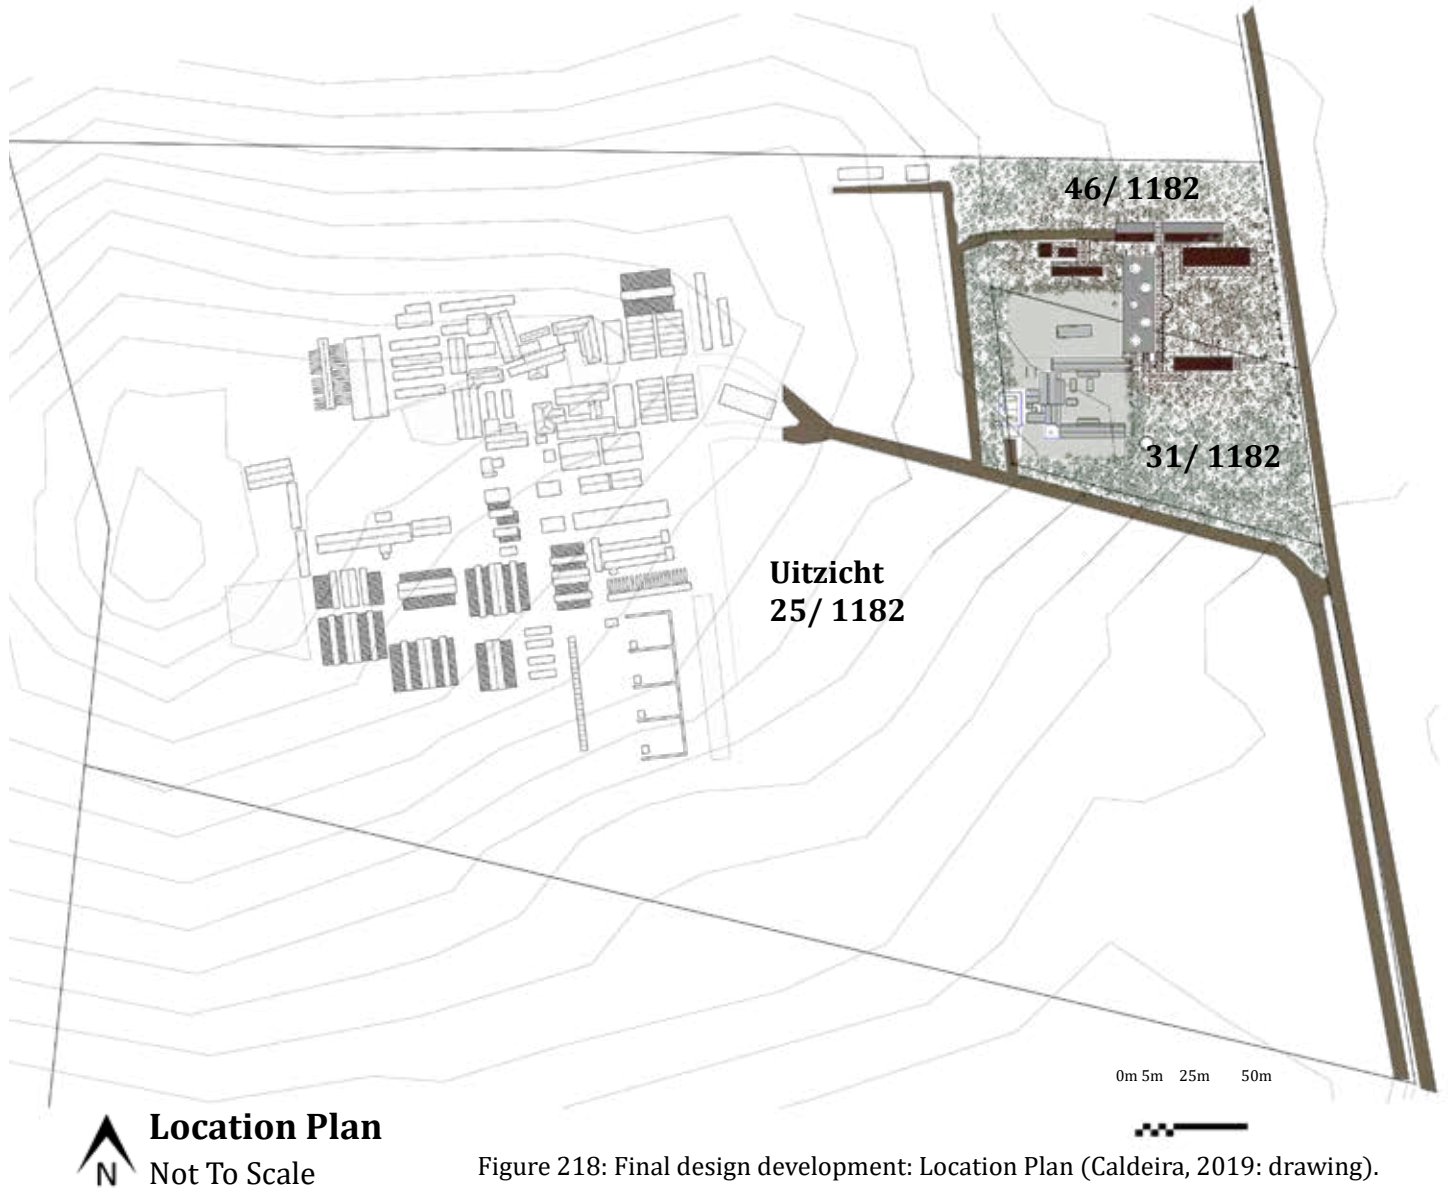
Final design development: Location Plan (Caldeira, 2019: drawing).
